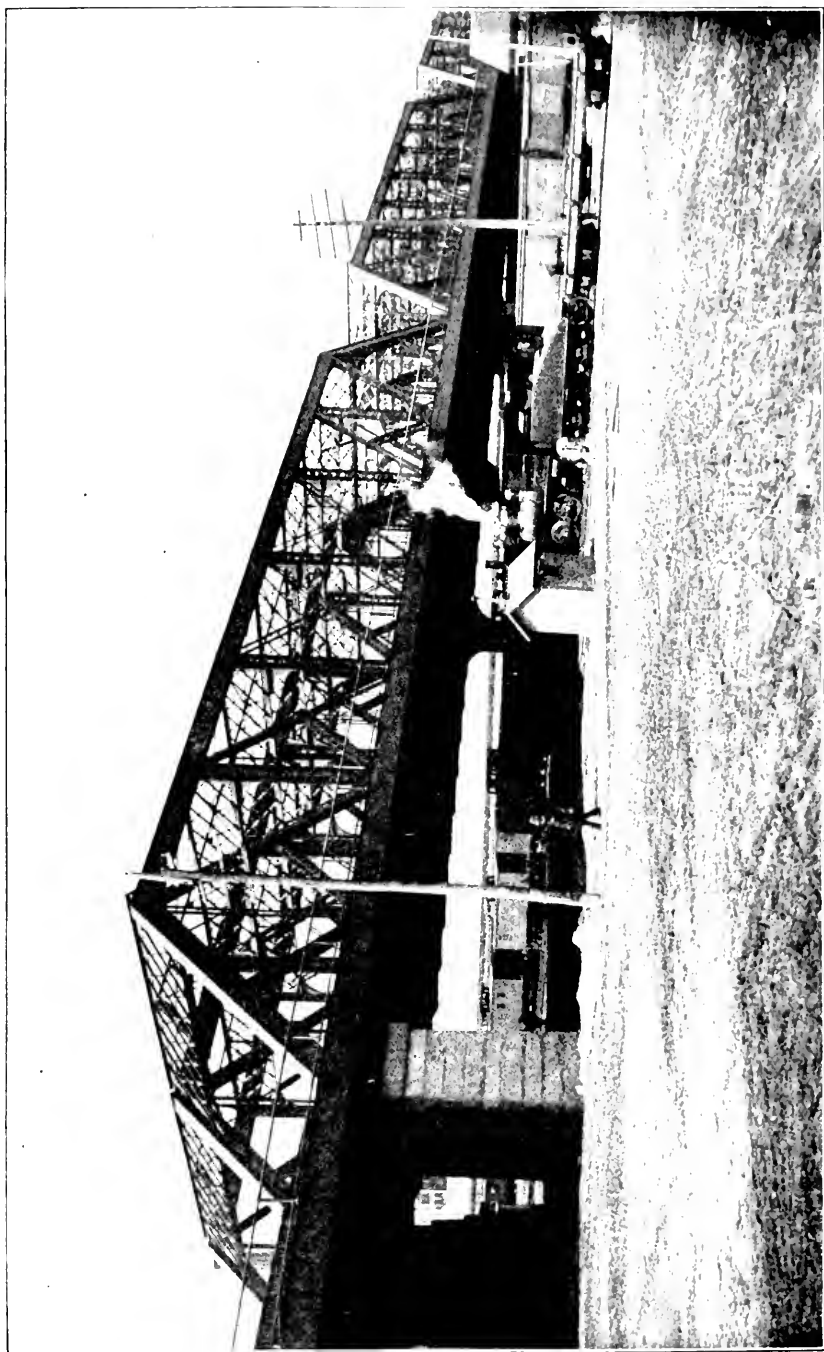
GENERAL VIEW SUMMER STREET BRIDGE OVER NEW YORK, NEW HAVEN AND HARTFORD RAILROAD.
